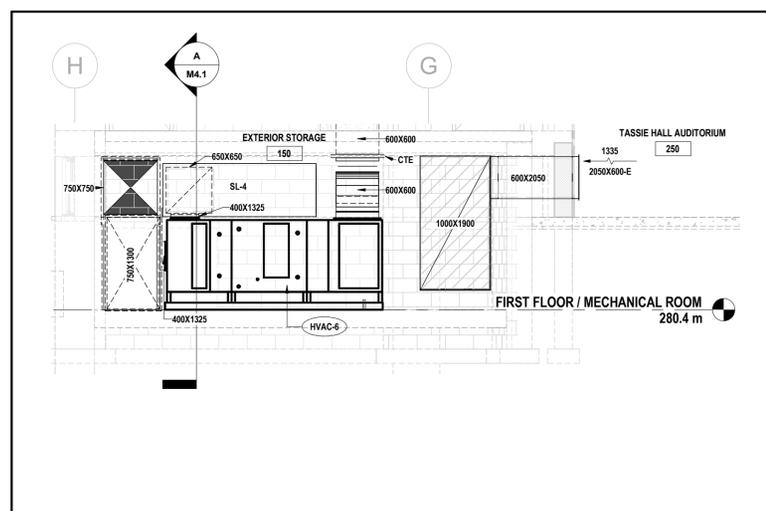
DETAIL C: AHU SECTION THROUGH MECH ROOM DOOR
